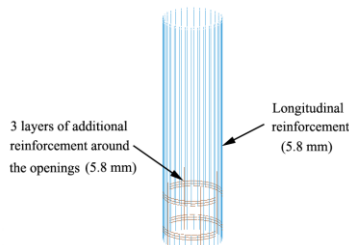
Opening reinforcements and longitudinal rebars of the chimney section
